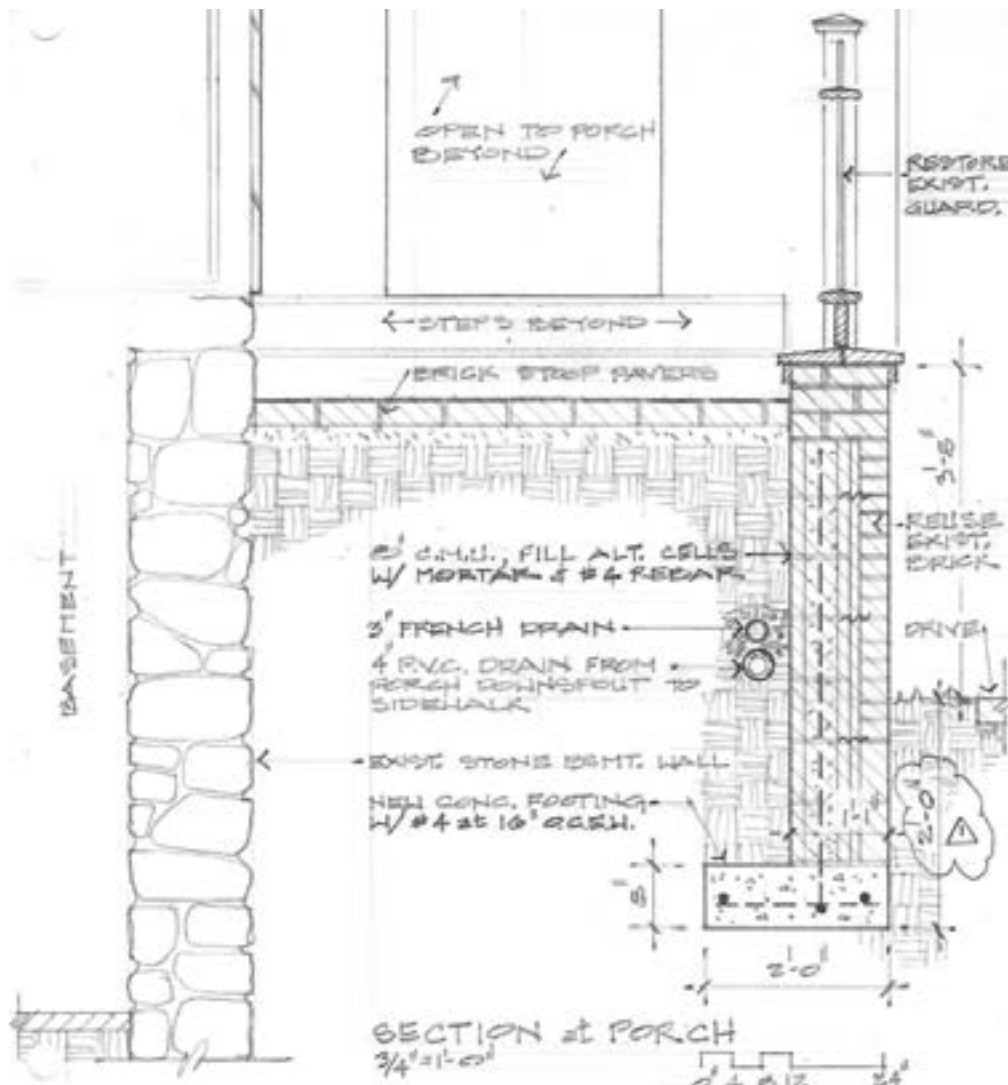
Al Cox, Section detail showing stoop and porch foundation repairs revised 10 Oct. 2022.
